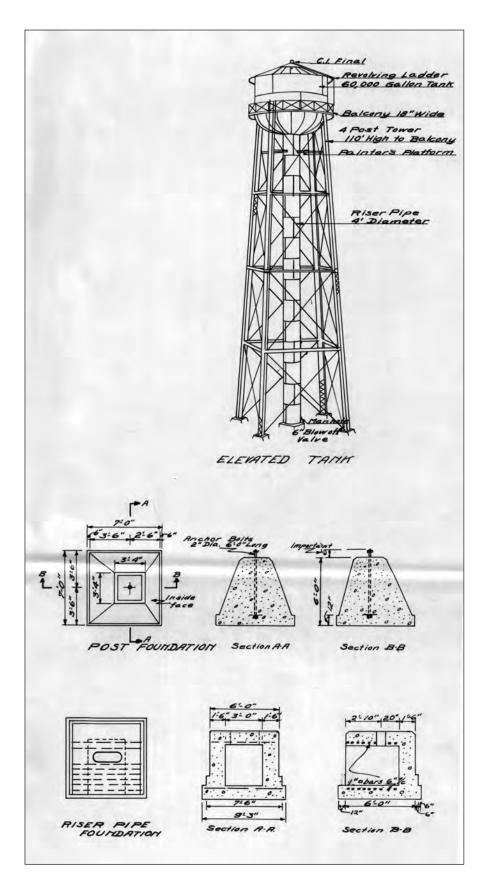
Detail of plans (Caldwell Engineering Company, 1928)
